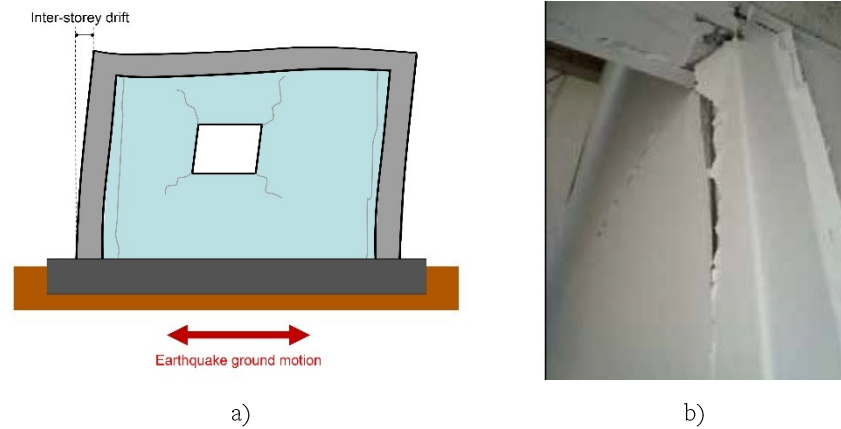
Effects of the building deformation on non-structural components and systems: a) An example of non-structural damage; b) Damage at joints between a steel structure and a lightweight steel gypsum board partition wall, Knauf De Chile Ltda Offices, 2010 Chile Earthquake (photo courtesy by Knauf Chile)
